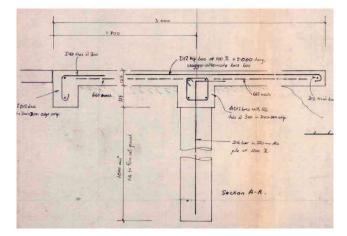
1978 garage floor and foundation details. The cantilevered portion of floor overhangs the southern portion of the slope where new retaining walls are proposed.
